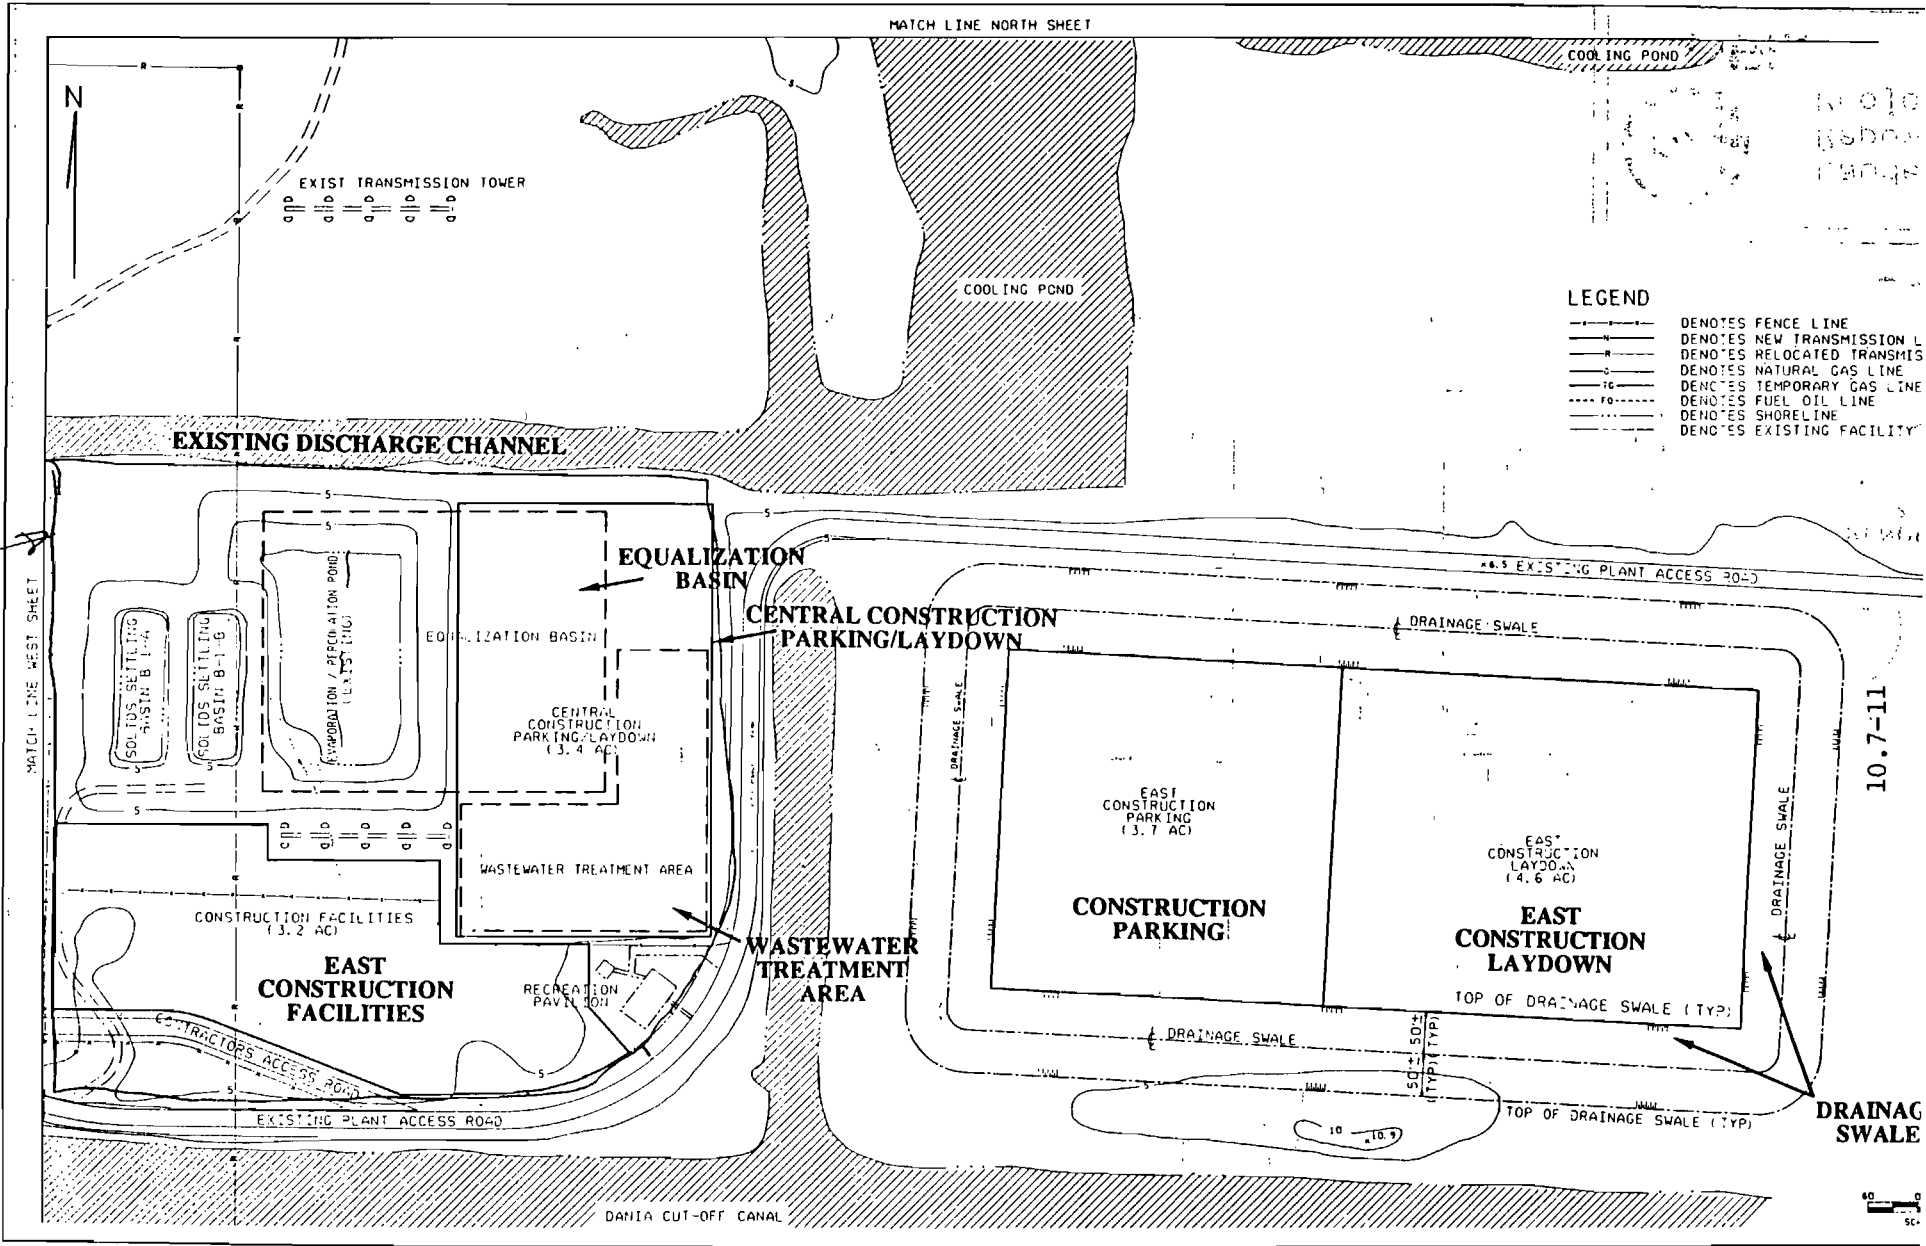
Site Drainage - Eastern Portion of Site
